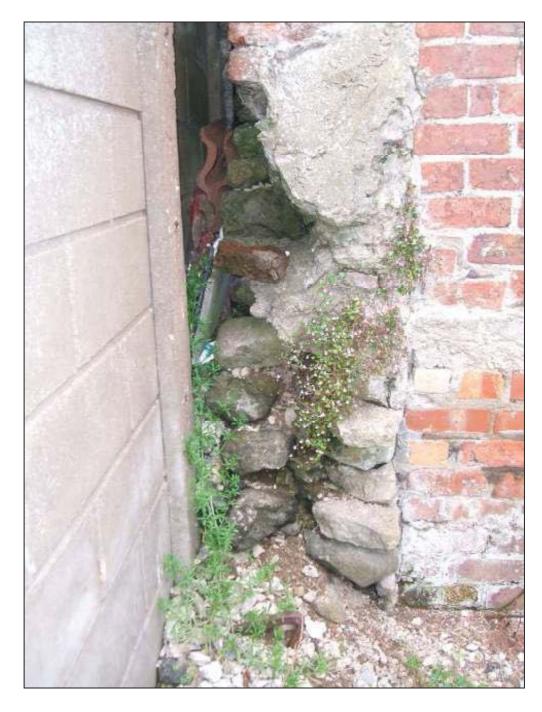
Detail of stone walling in possible fish-curing structure, looking north-north-east
